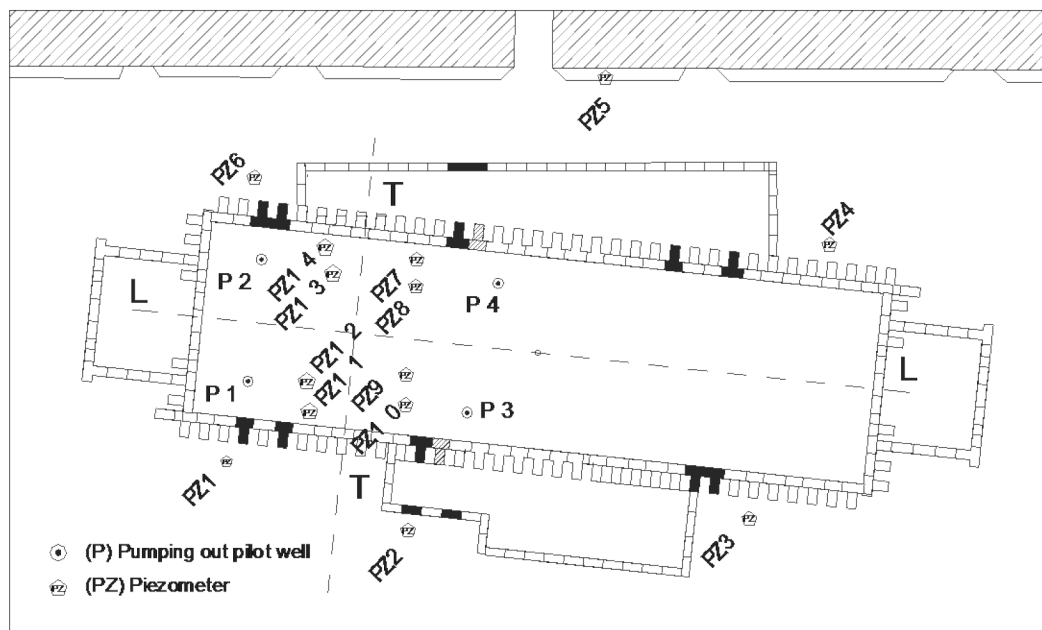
Plan view of station shaft with layout of monitoring system for the dewatering trial test.
